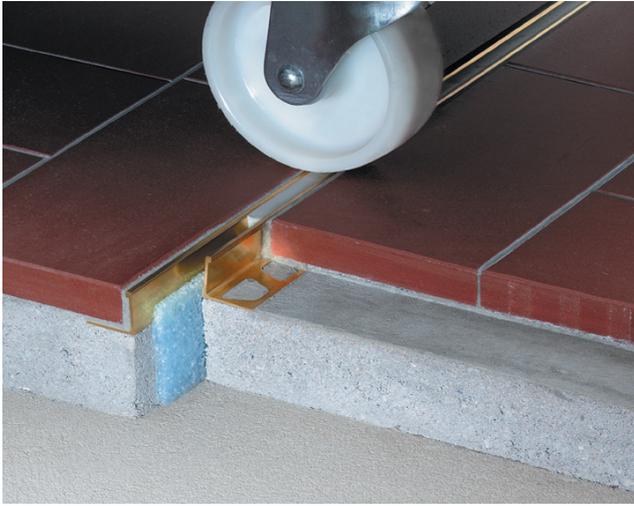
Construction of joints in areas with edge strengthening where there is rolling traffic
